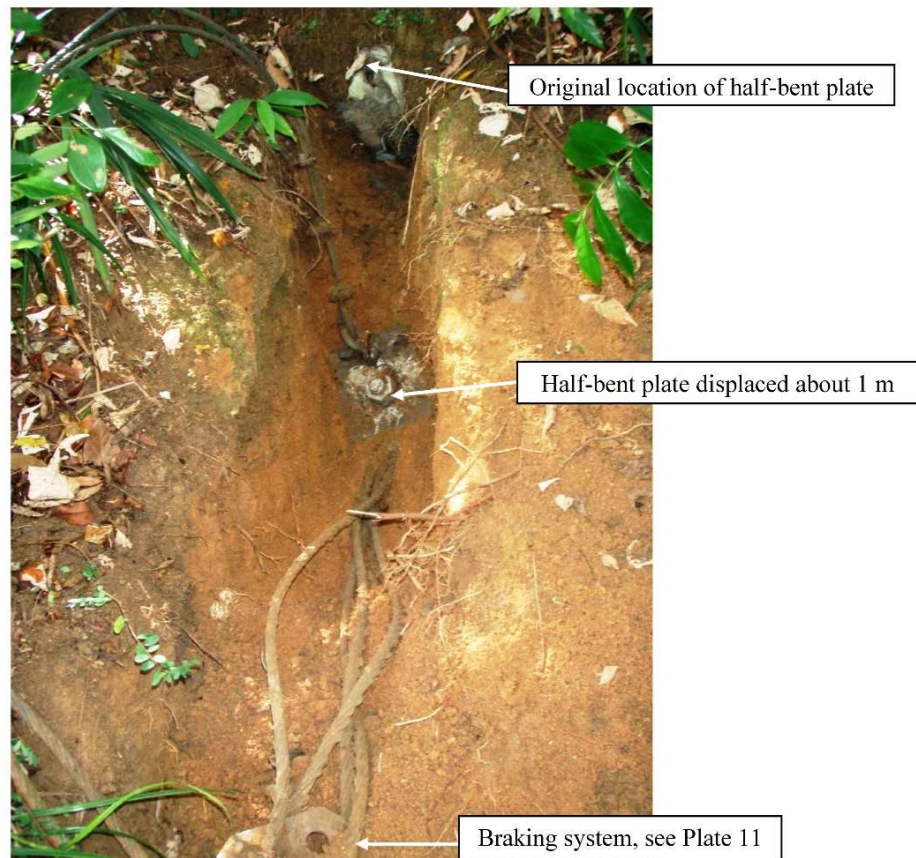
Anchor Bent Leading to Failure of the Front Part of Grout Block
